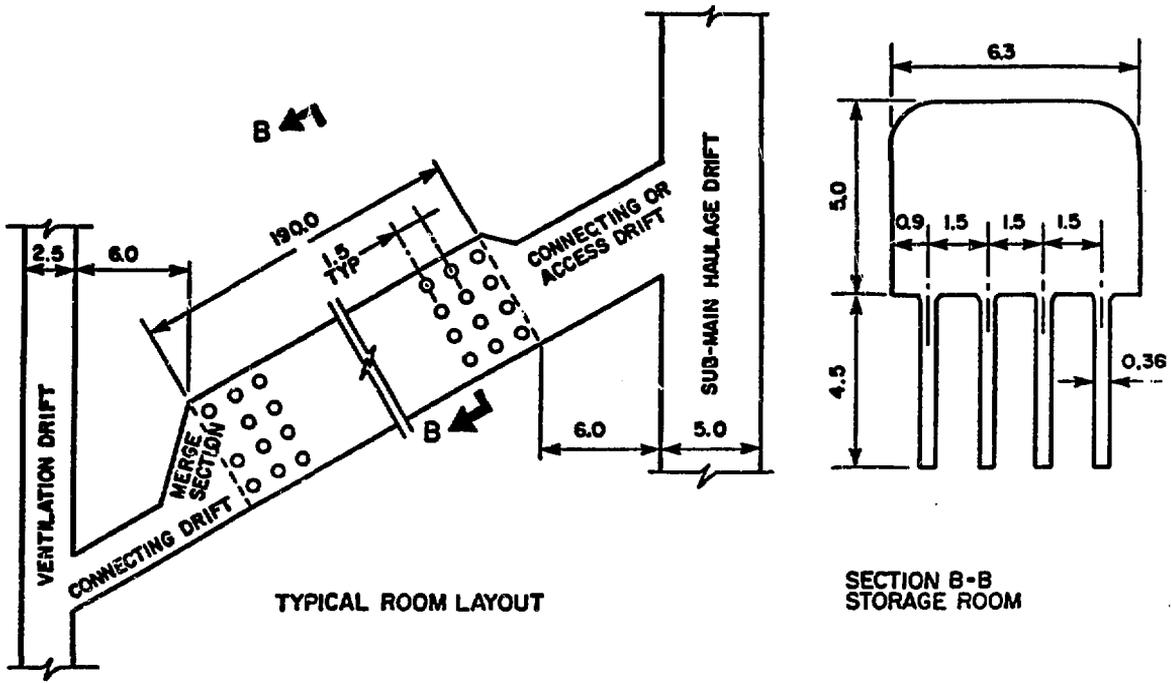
TYPICAL ROOM LAYOUT AND STORAGE PANELS (ALL DIMENSIONS IN METRES)
